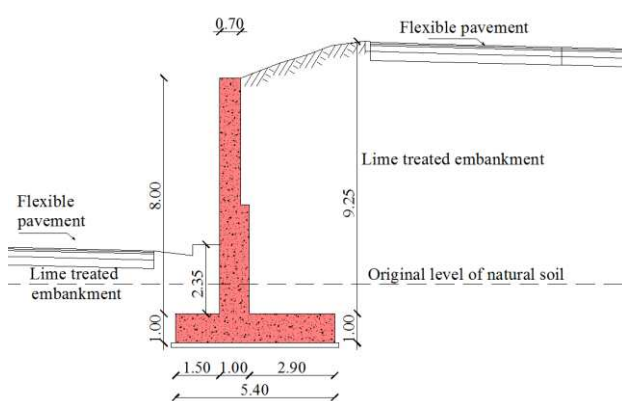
Cross-section of the reinforced cantilever wall (segment of maximum height)
